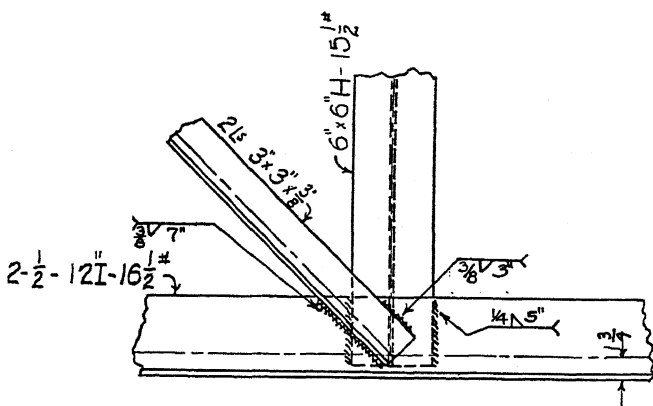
shows the position of the web members and the welding at the top chord joints C while Fig. 891 shows the corresponding arrangement at bottom chord panel points B. The welding is indicated by the new welding symbols of the American Welding Society.
